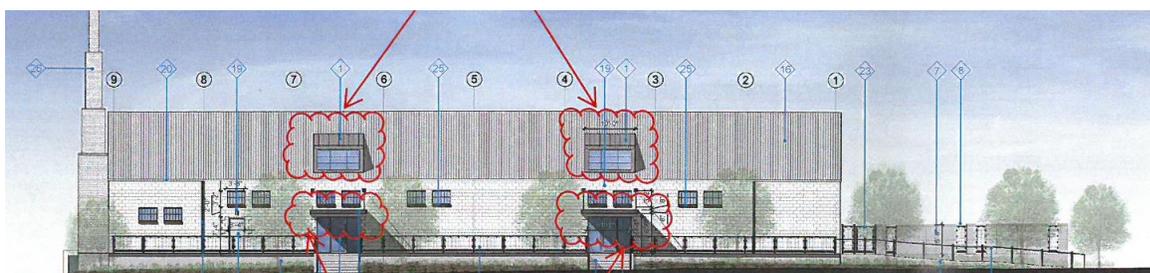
Approved LAC drawings, East Elevation, 2016. Note indicates corrugated galvanized roofing on the new dormers and construction of canopies at the entrances.
